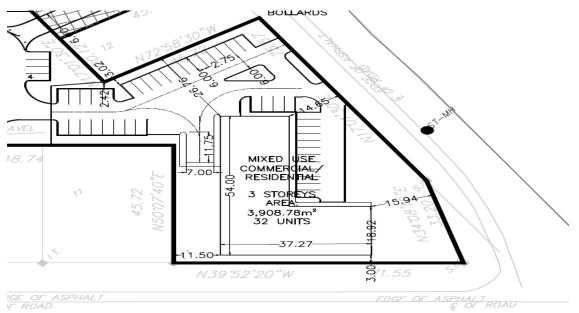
Proposed Mixed-Use Commercial Building within Preliminary Site Plan, prepared by IBI Group
